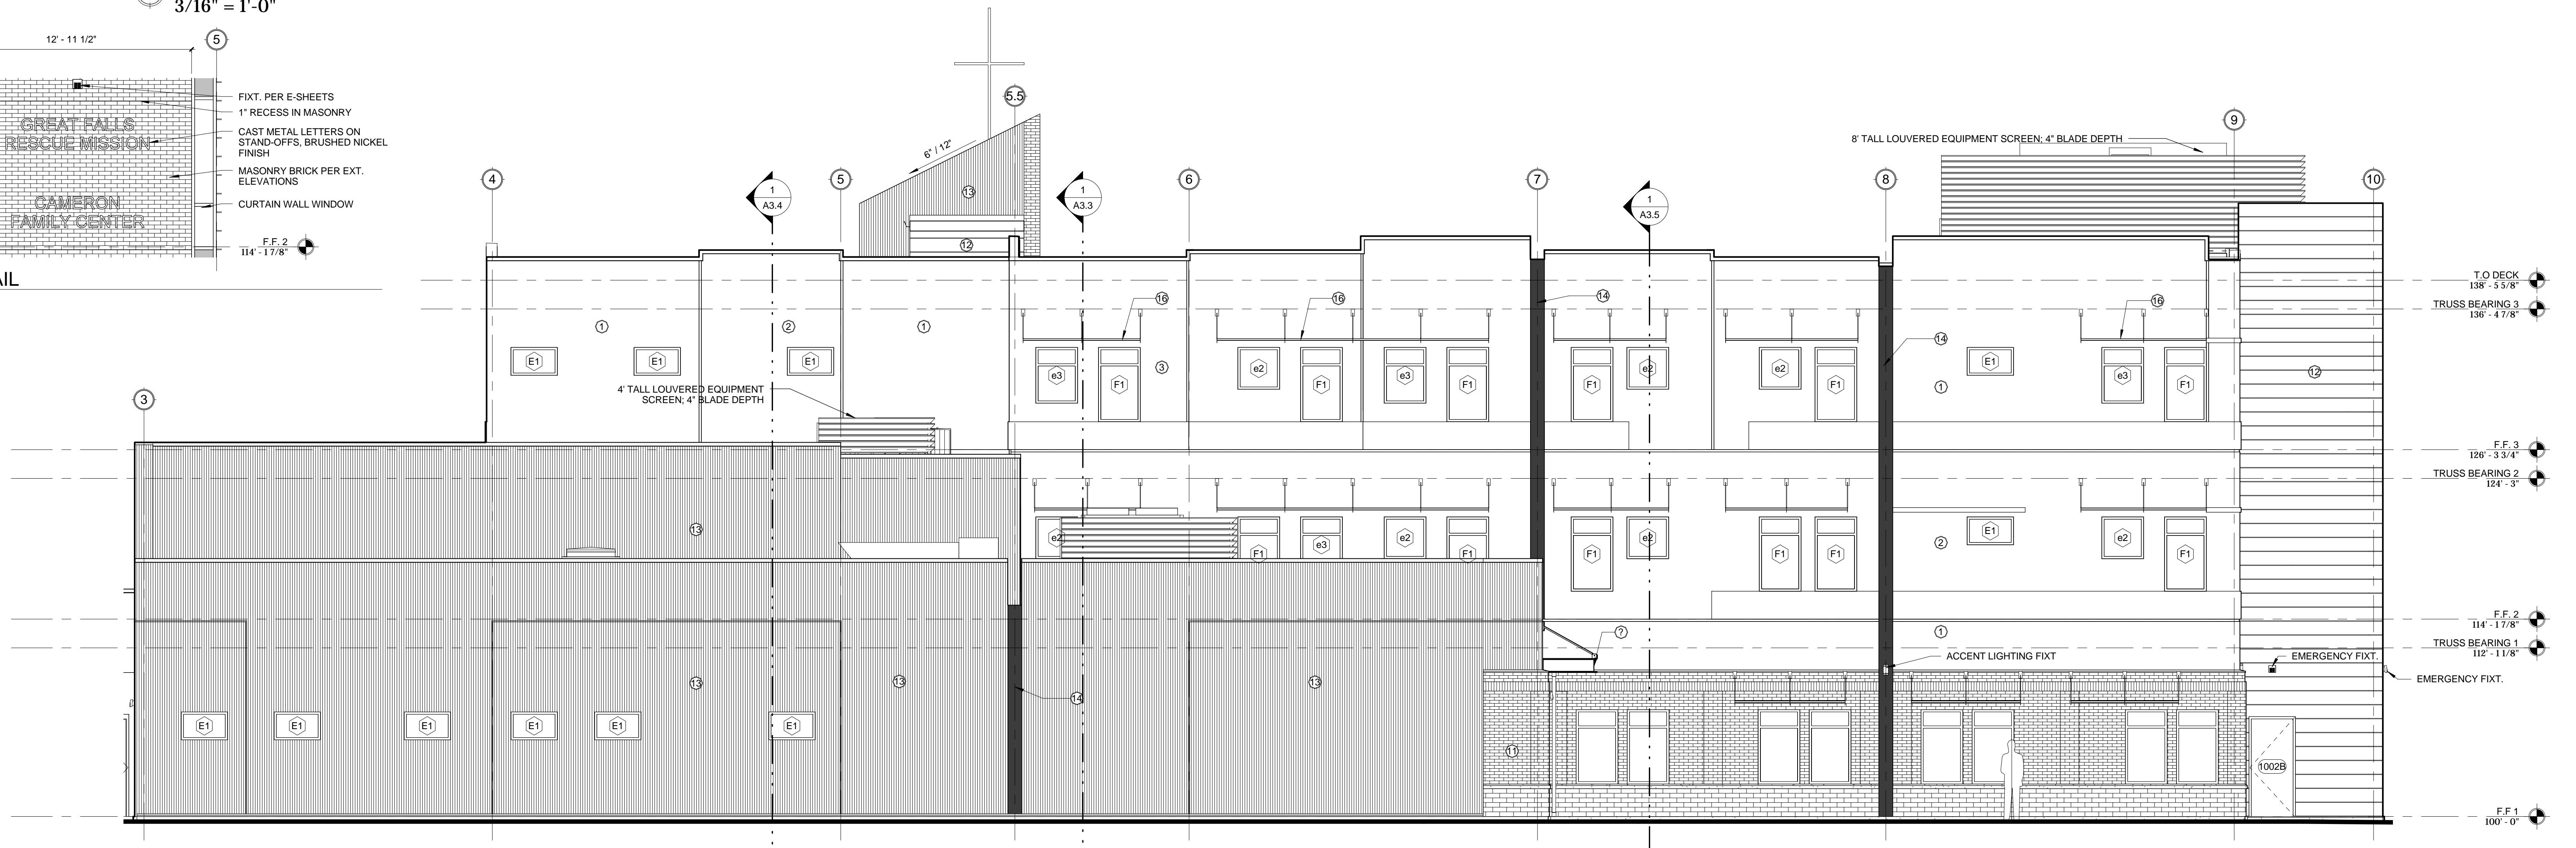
EXHIBIT E - PLAN SET (SITE PLAN, LANDSCAPE PLAN,
